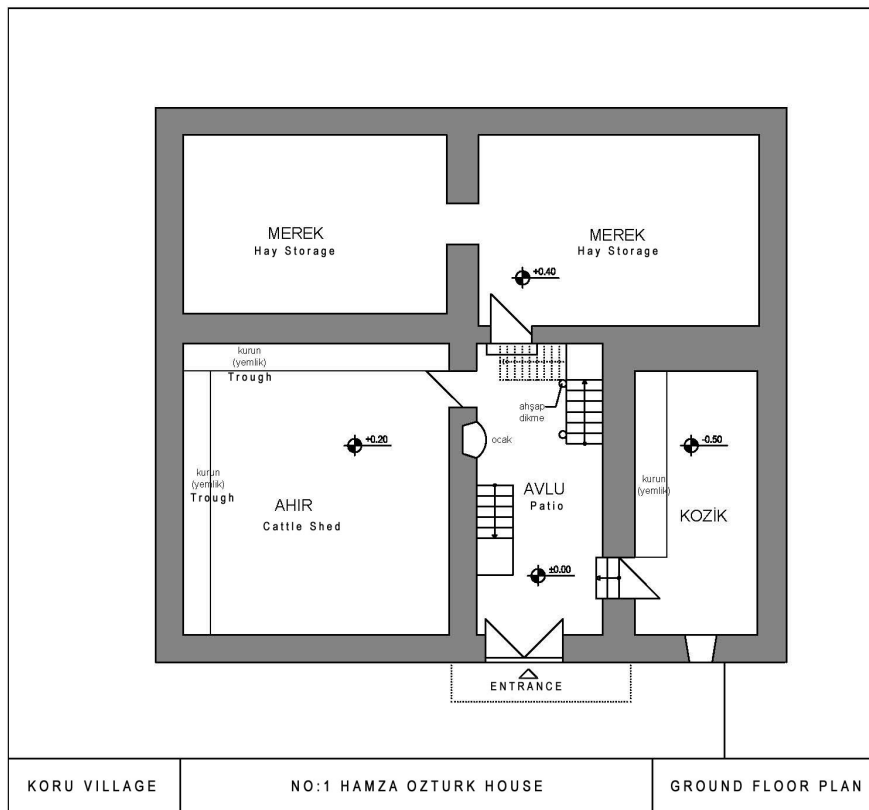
Ground Floor Plan of Hamza Öztürk House.
